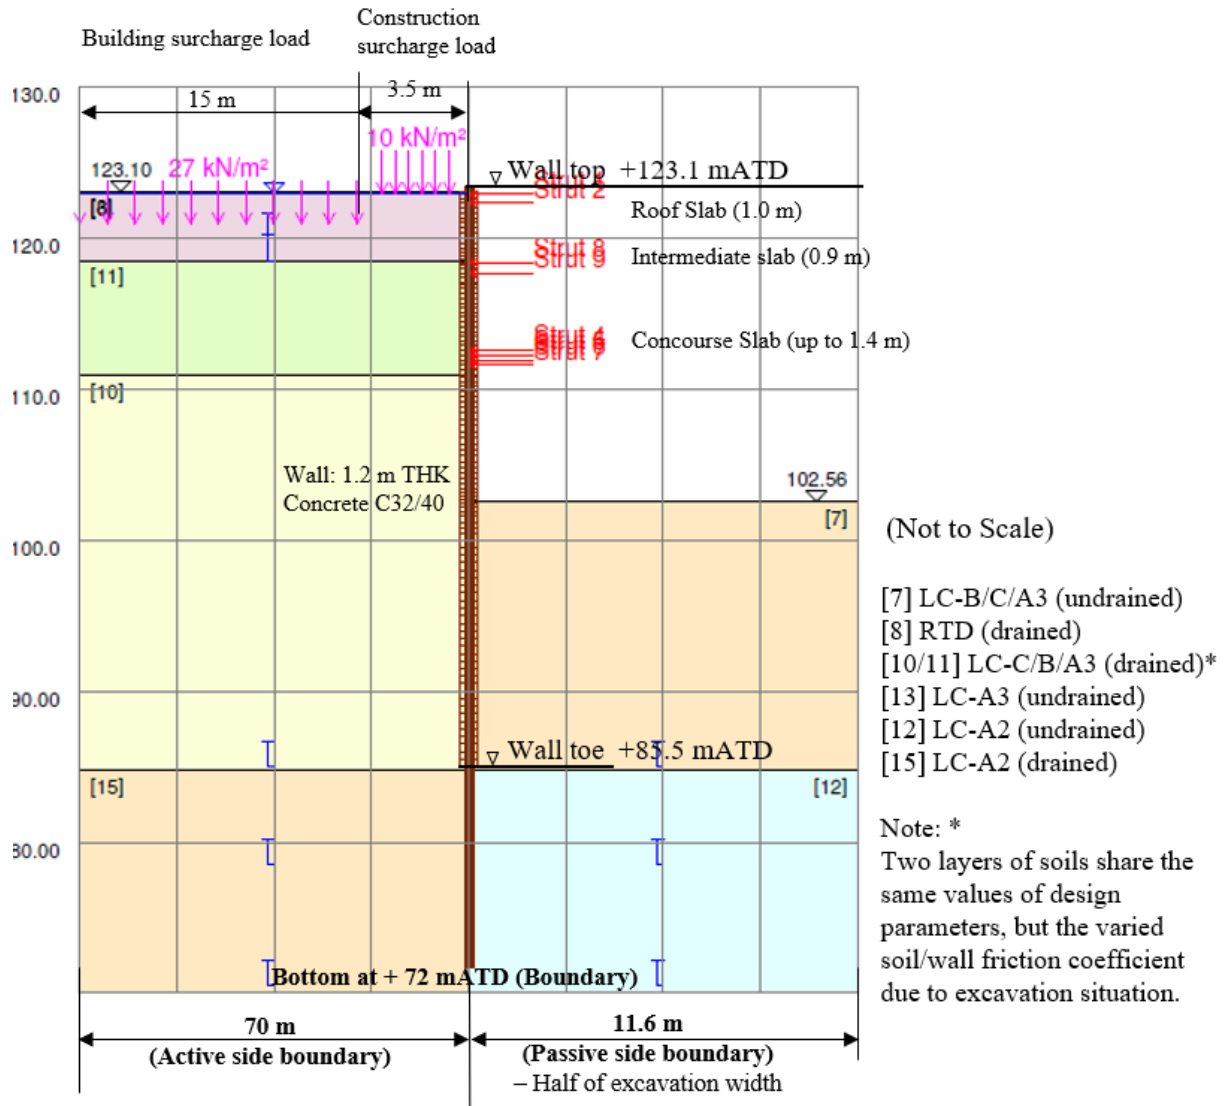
14 FREW model for PAD station box excavation at final excavation stage 17
